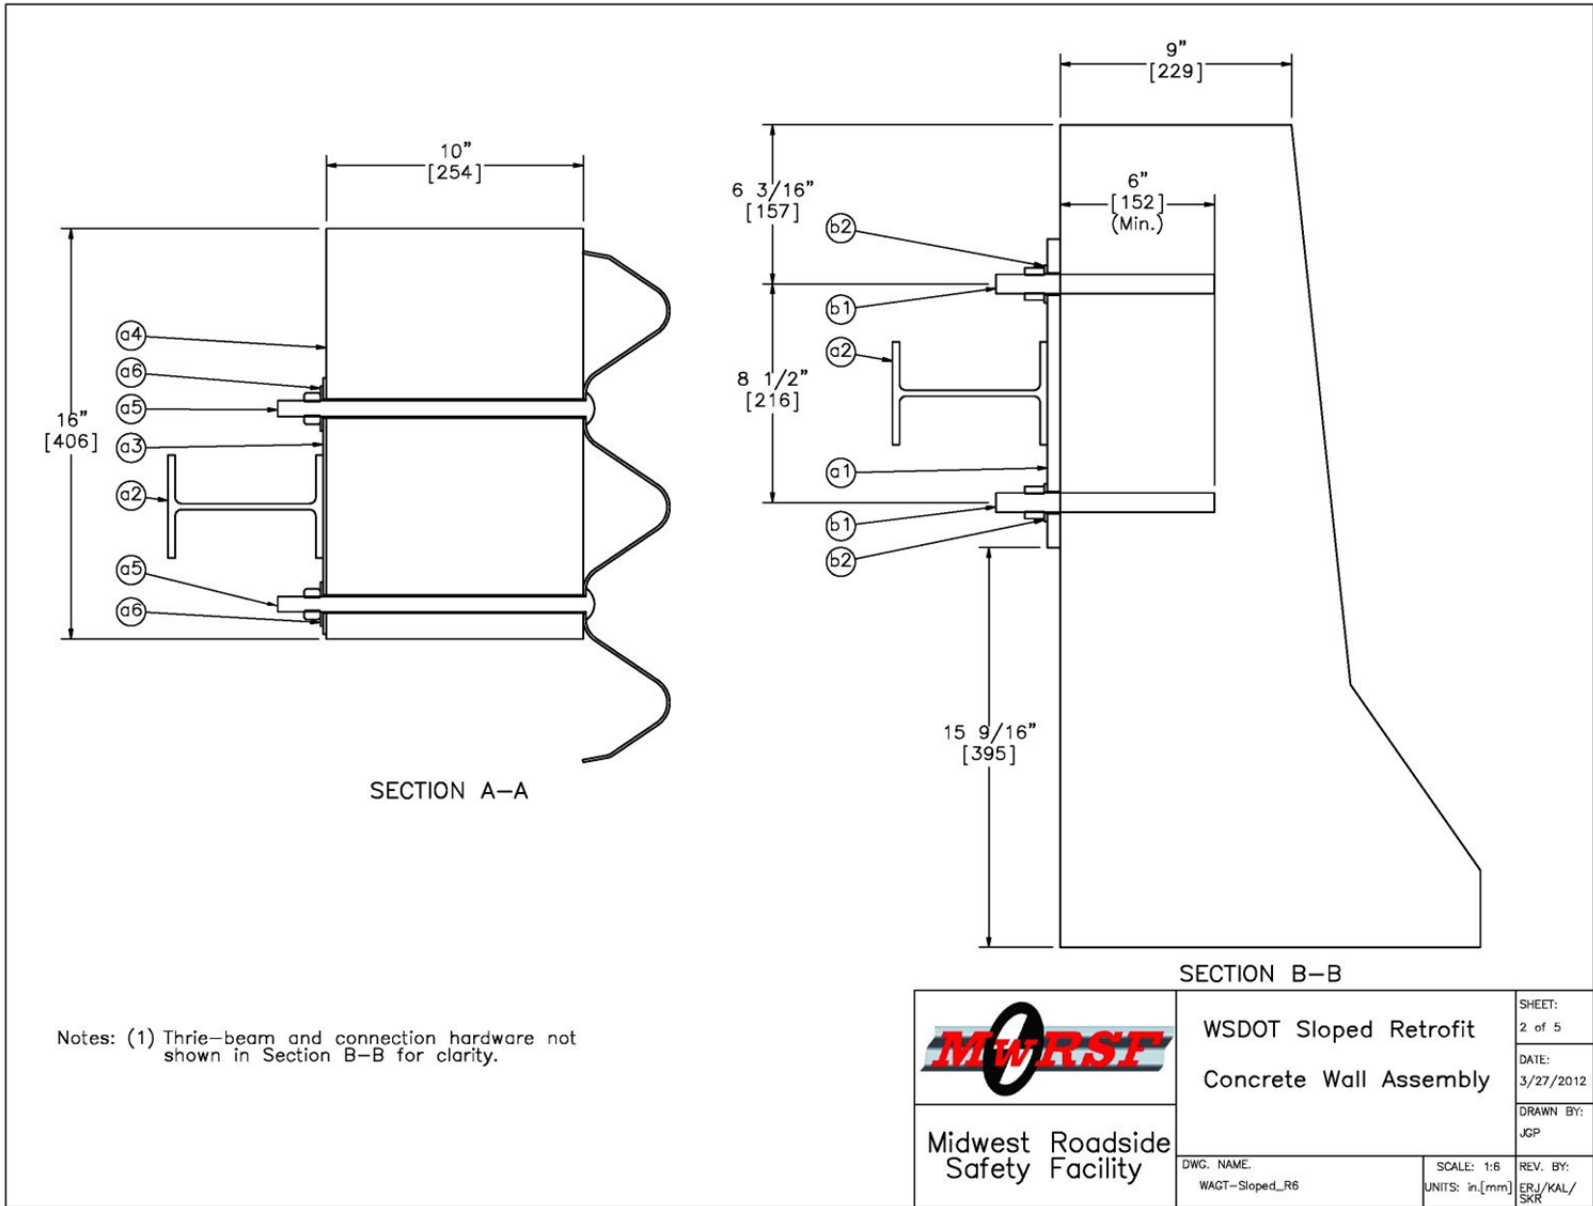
Retrofit 1 – Sloped-End Concrete Wall Assembly – Side View
